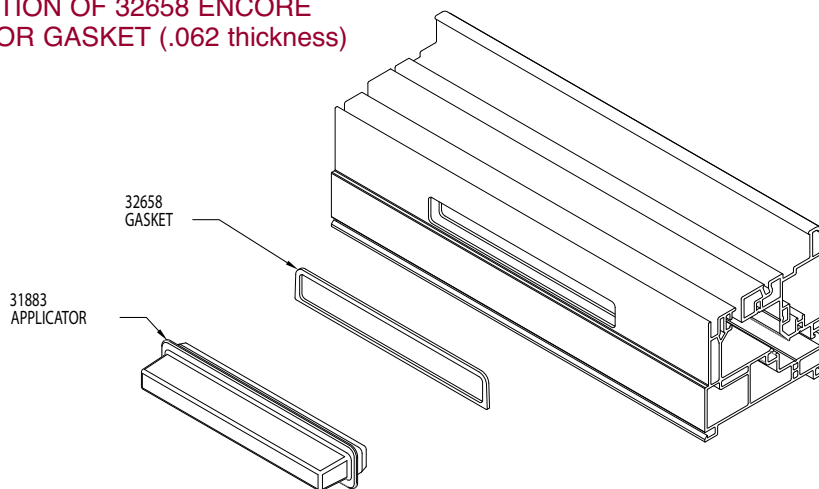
ENCORE OPERATOR GASKET 32658 (32855 Gasket with .093 thickness not shown)
